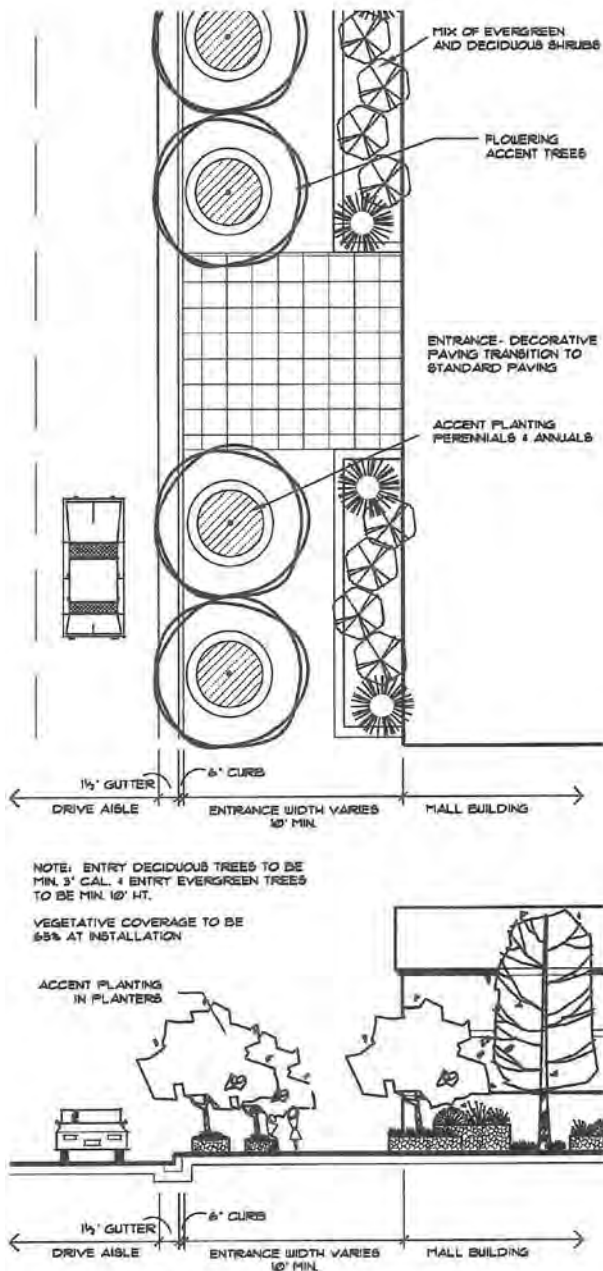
B TYPICAL MALL BUILDING ENTRY
